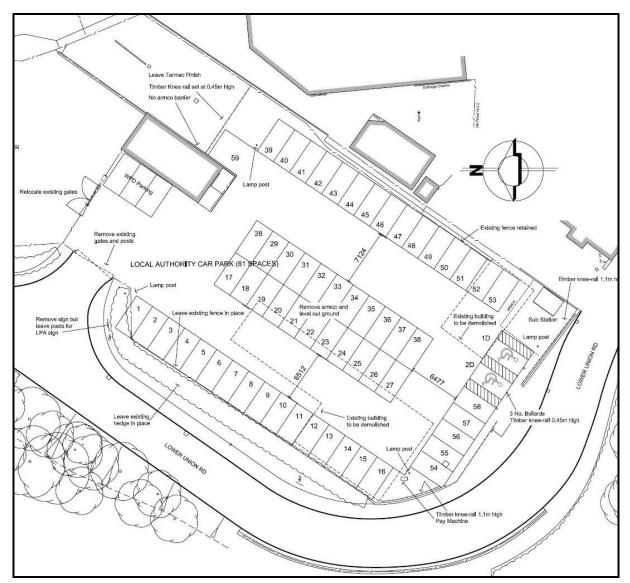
PLATE A: Proposed layout of car park in the detached portion of the proposed development site
